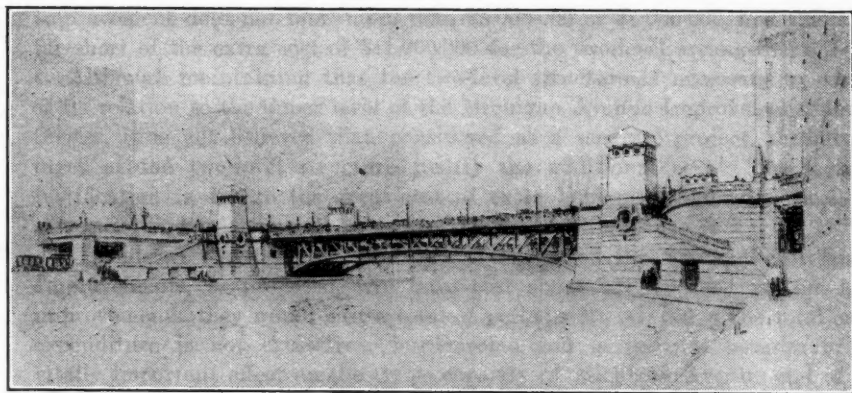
VIEW OF TWO-LEVEL MICHIGAN AVENUE BRIDGE.
